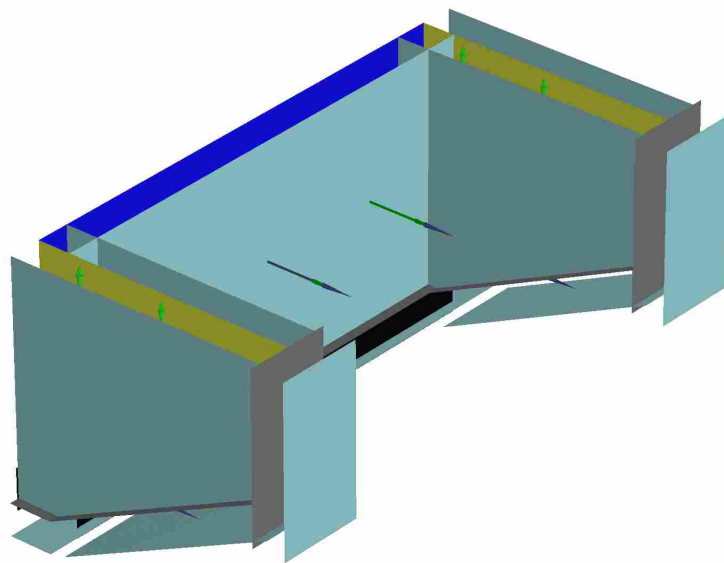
Pile cap and reinforced concrete wingwall interfaces.
